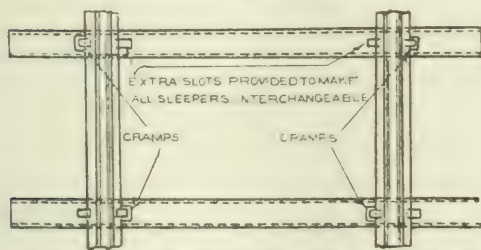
PLAN SHOWING TWO SLEEPERS IN POSITION.
